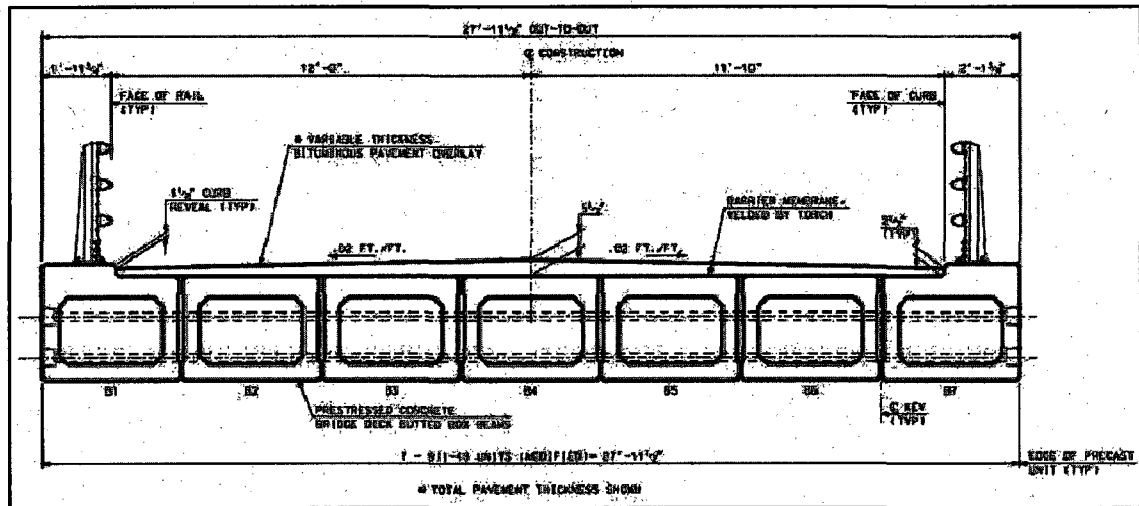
Mill Street Bridge superstructure (PCI, 2005)
